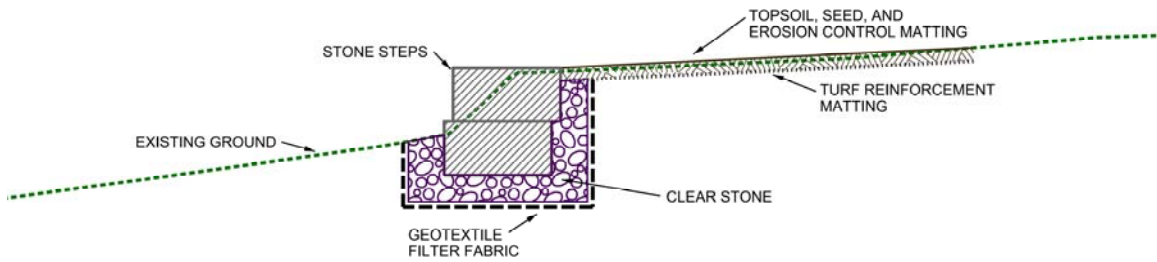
An example of the cut limestone shoreline access/revetment. This treatment will be used to stabilize the bank in areas where the bike path is very close to the shoreline. It will also be used in short sections to provide a stable access point to the lagoon for park users.
